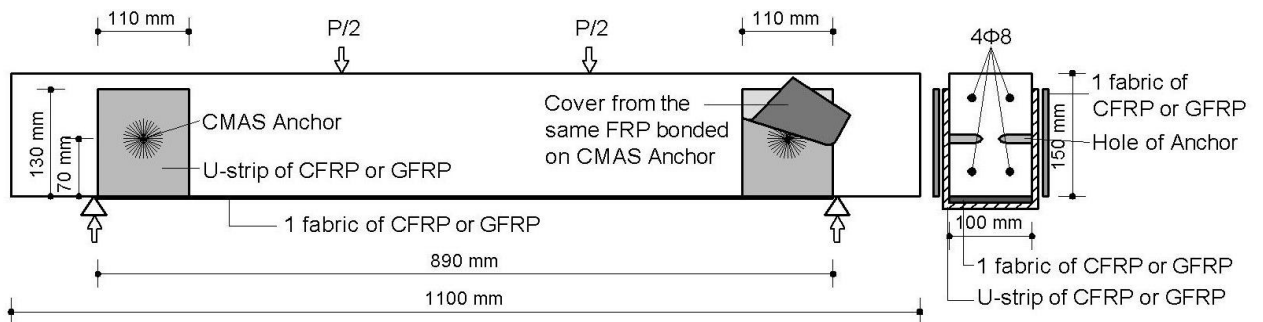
Details of the composite material anchorage system (CMAS) used with FRPs in strengthened RC beam
